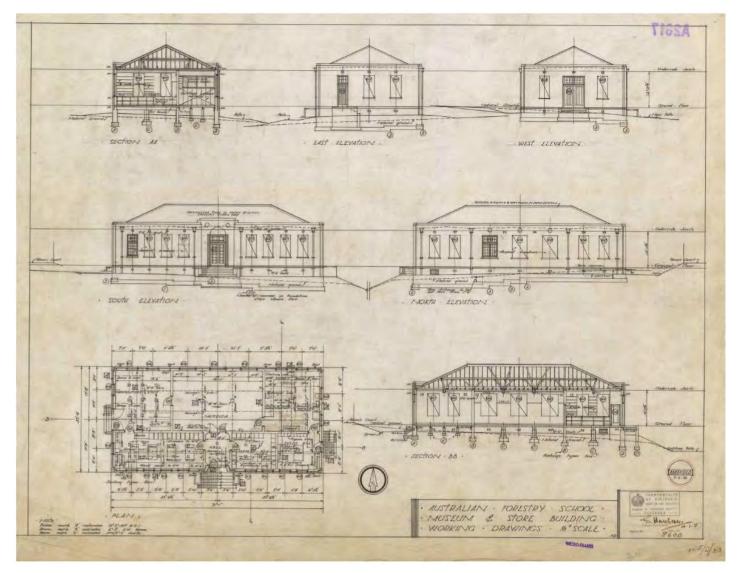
Museum and Store Building plan 1935 (NAA #7689917)
